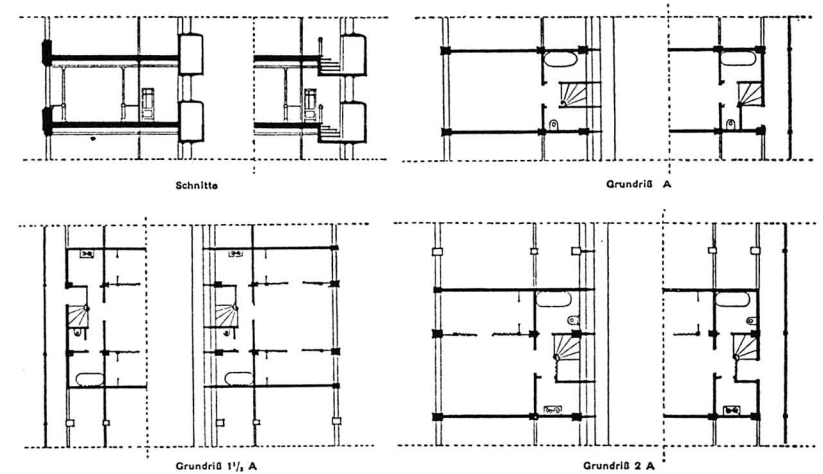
A. Zilchenko: Apartment layouts with corridors dividing the floors.
